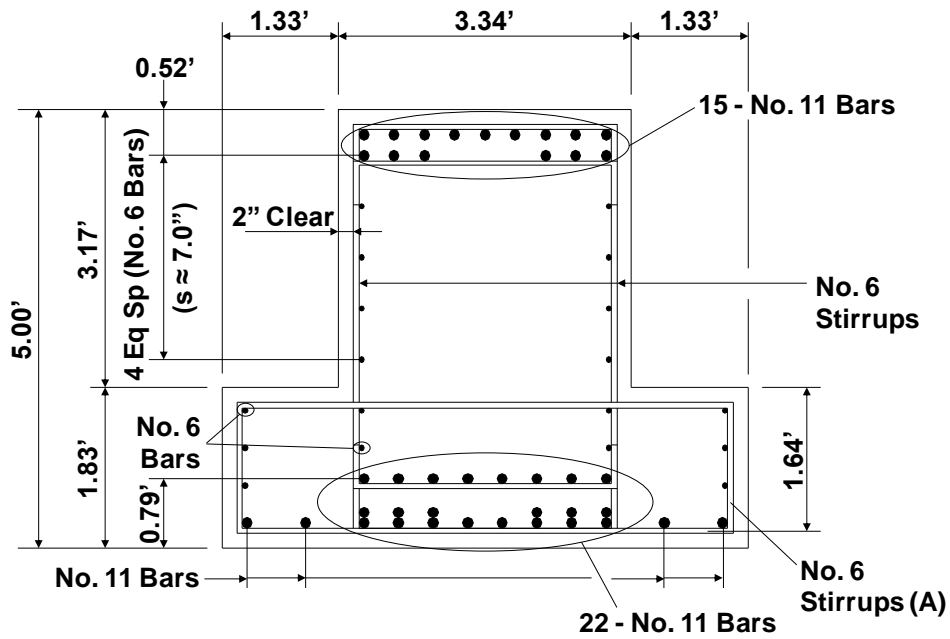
Reinforcement details – elevation (design per proposed STM specifications – moment frame case)
